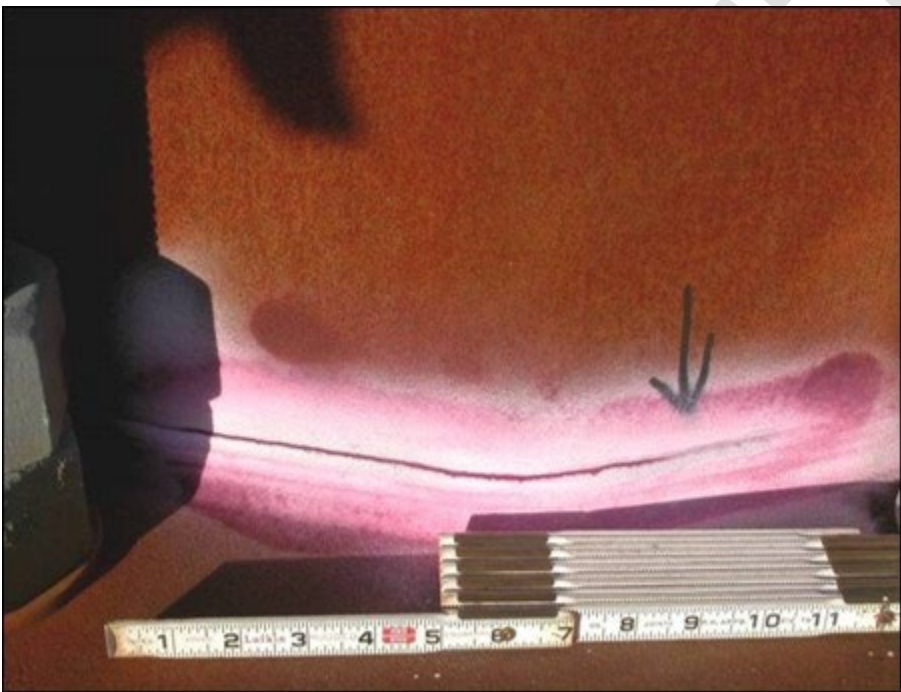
Crack at connection of HMLT vertical support column to base plate
